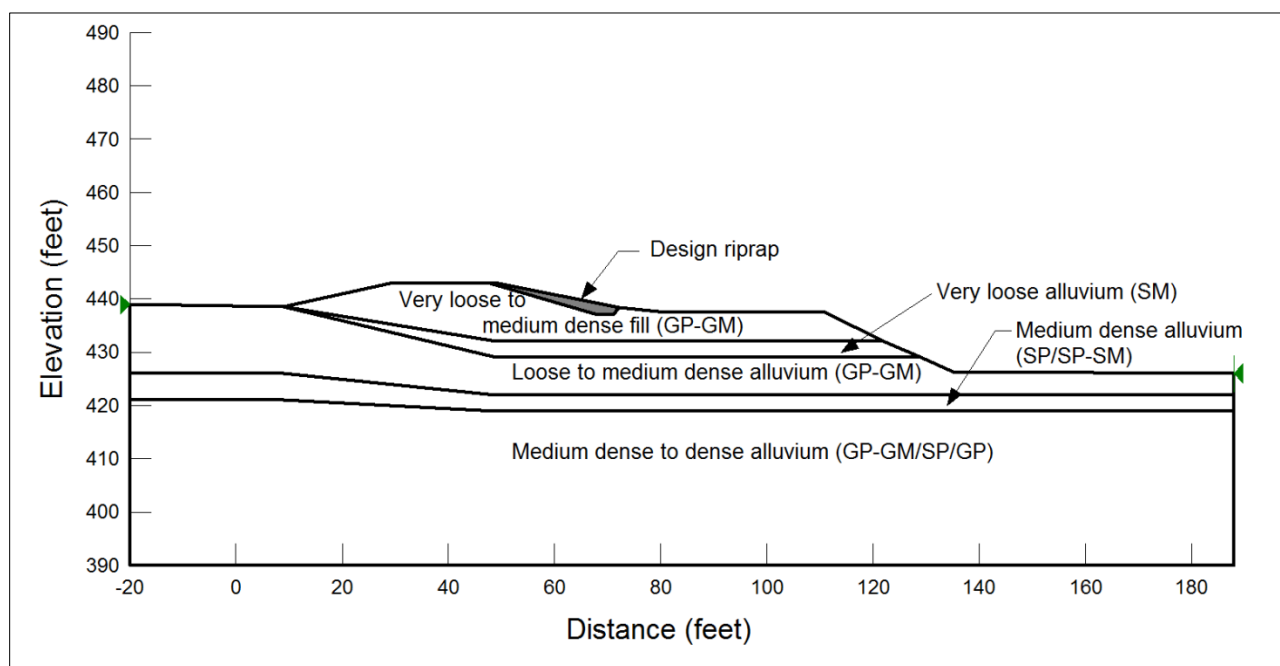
Levee Cross Section, Critical Section Location G-2
